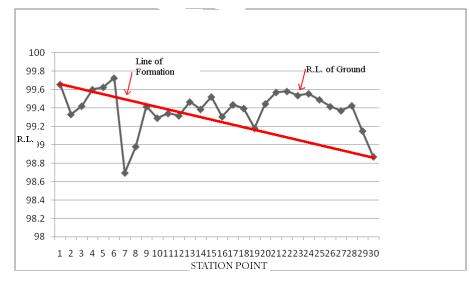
Showing the Longitudinal Section (L- Section) of Channel Alignment
